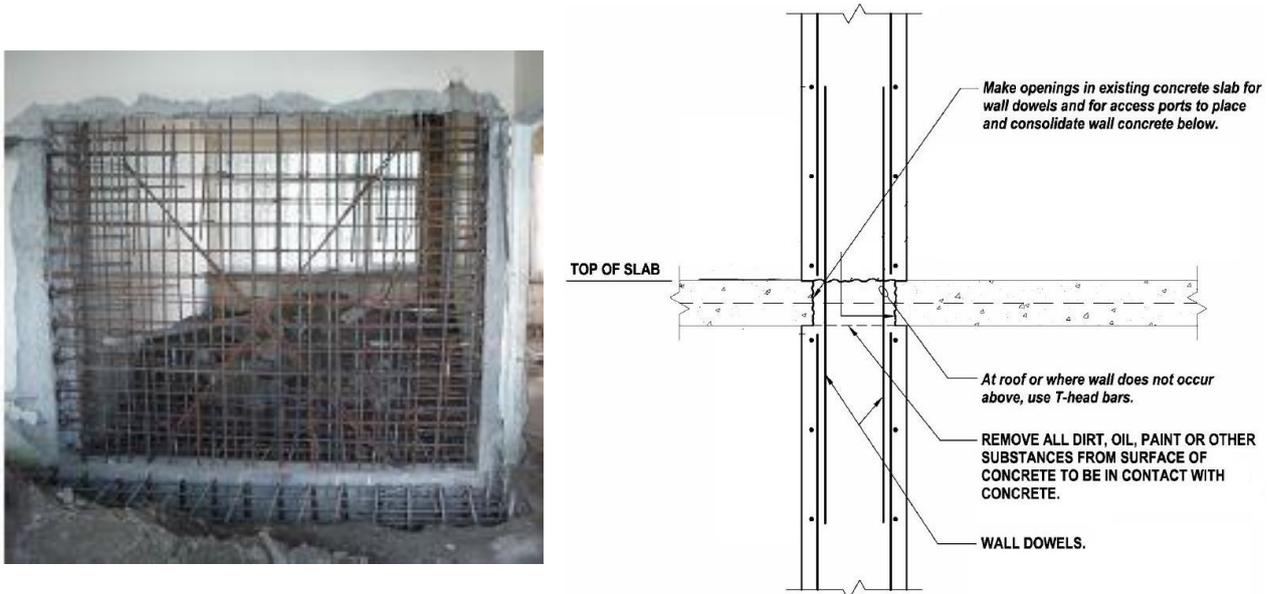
New concrete shear wall (left) and concrete wall connection to concrete slab (right).
